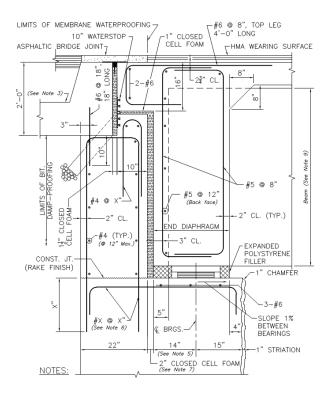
Waterproofing details at abutment (Asphaltic plug joint)
